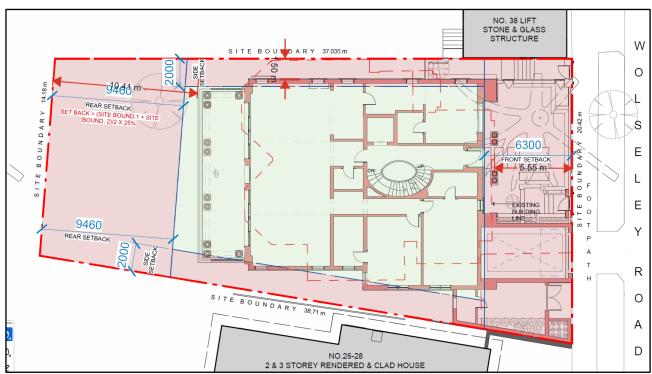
Proposed building setback diagram. Source: Submitted Architectural Plans
